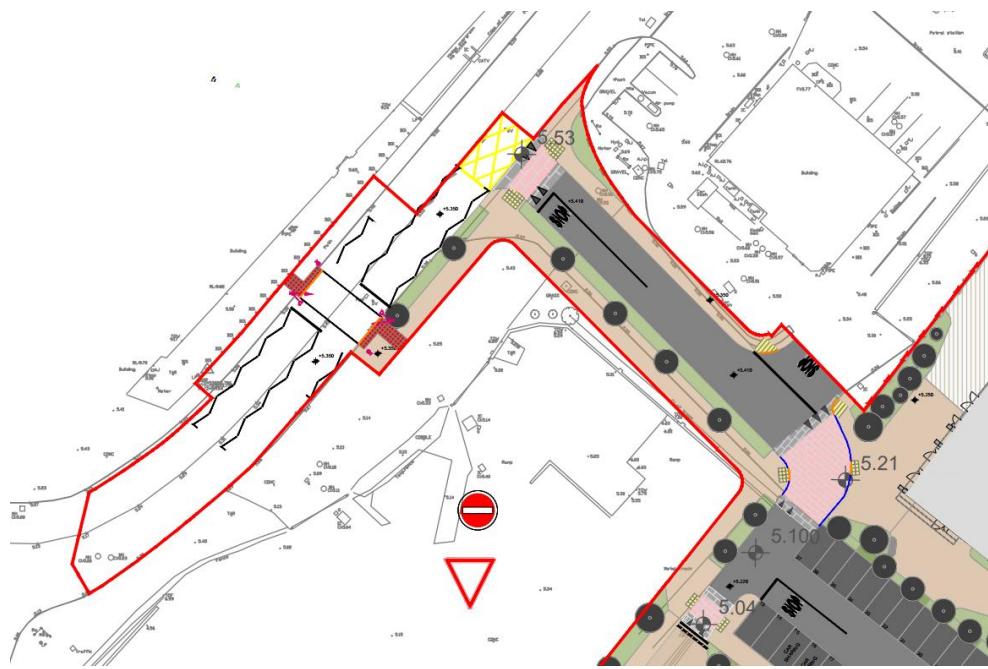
Proposed Lough Atalia Road Site Access Junction
